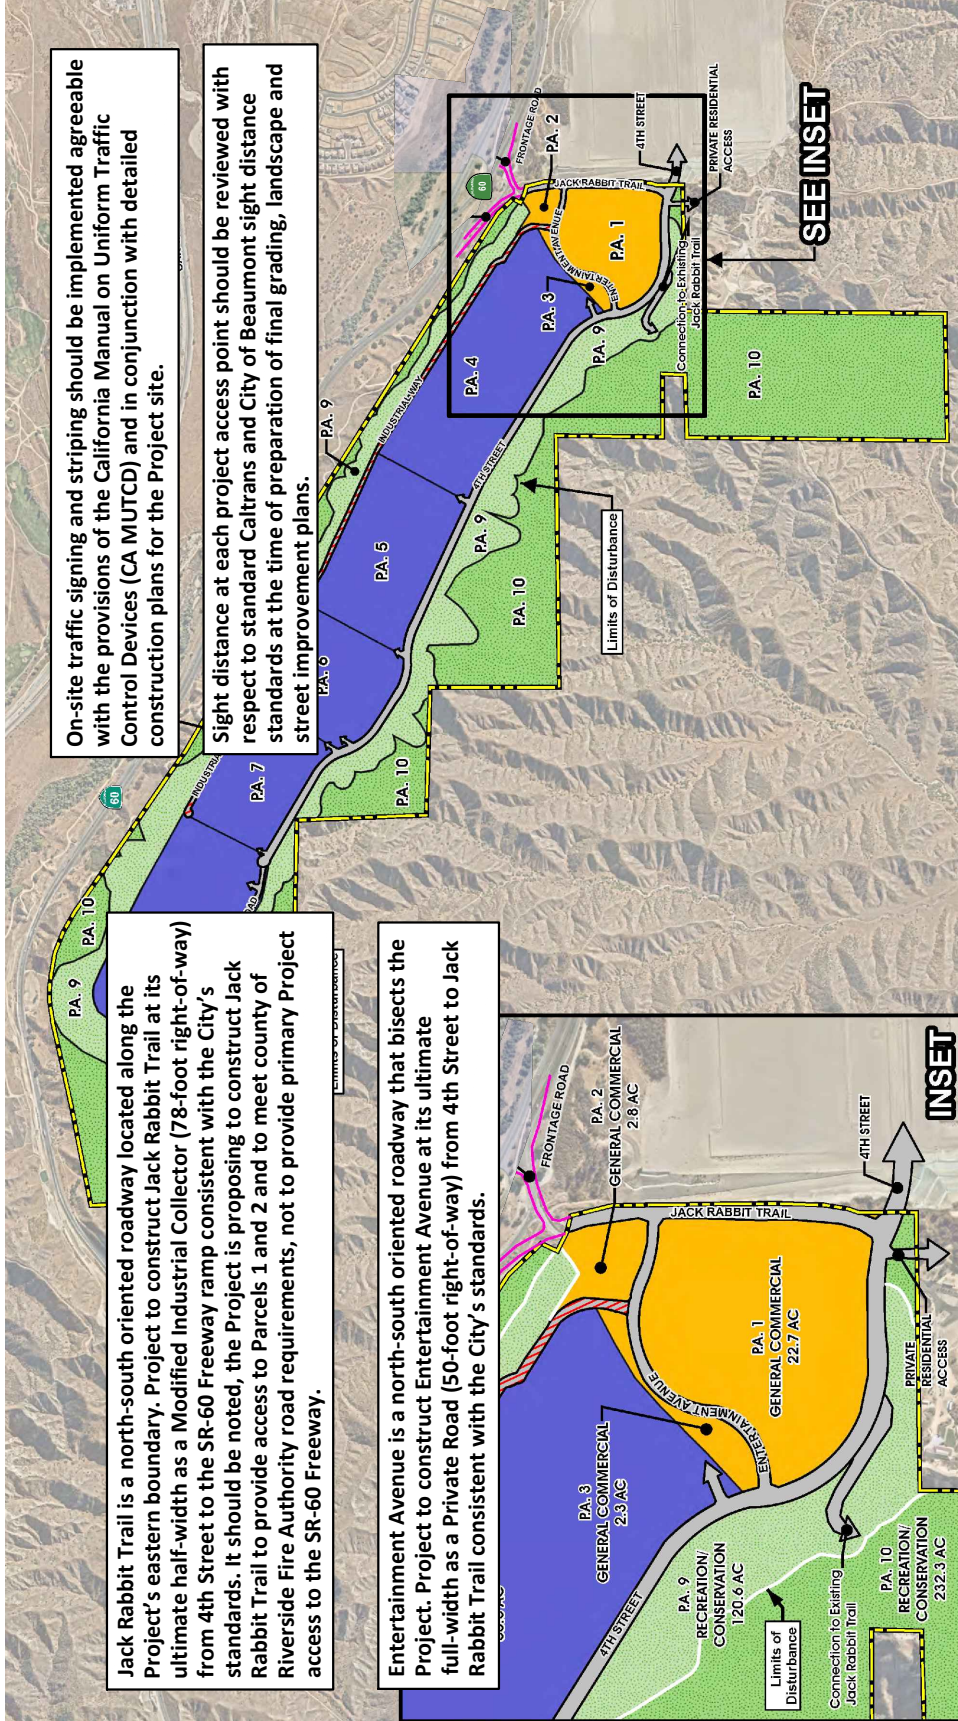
SITE ADJACENT ROADWAY AND SITE ACCESS RECOMMENDATIONS FOR PROJECT BUILDOUT
